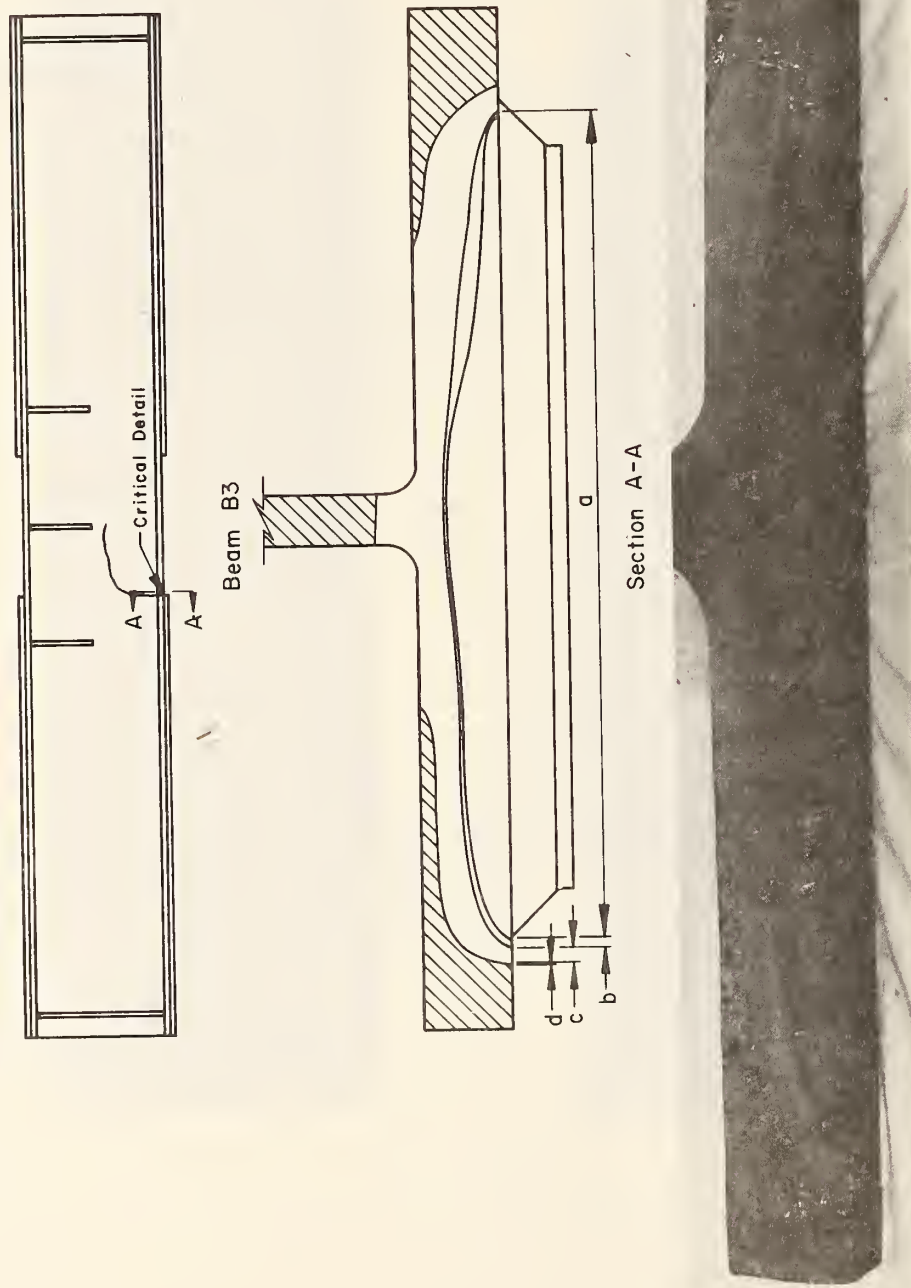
Fatigue and Fracture Surface, B3 (A36, W36X260)
